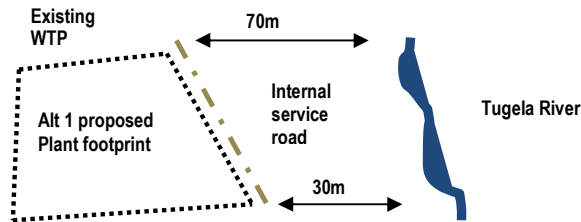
Preferred layout Alternative 1 proposal for new Water Treatment Plant
